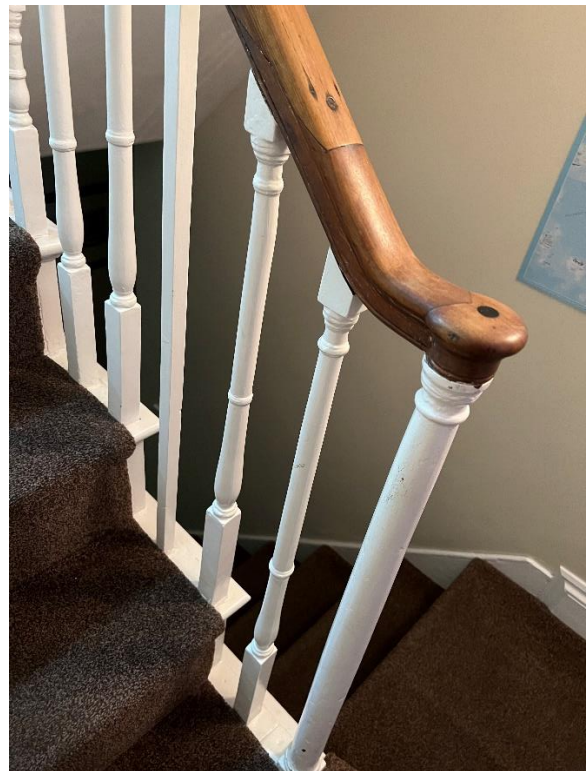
Detail of newel post and ramped rail on first floor (photo: Joe Hayes).
